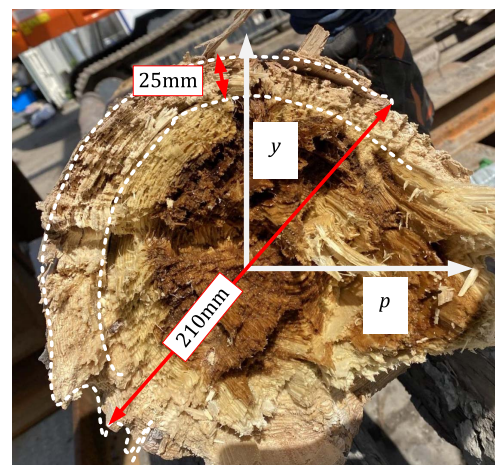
Photograph of bending failure cross section of Pile 3. The soft shell can be identified by the color and structure of the timber fibers.
